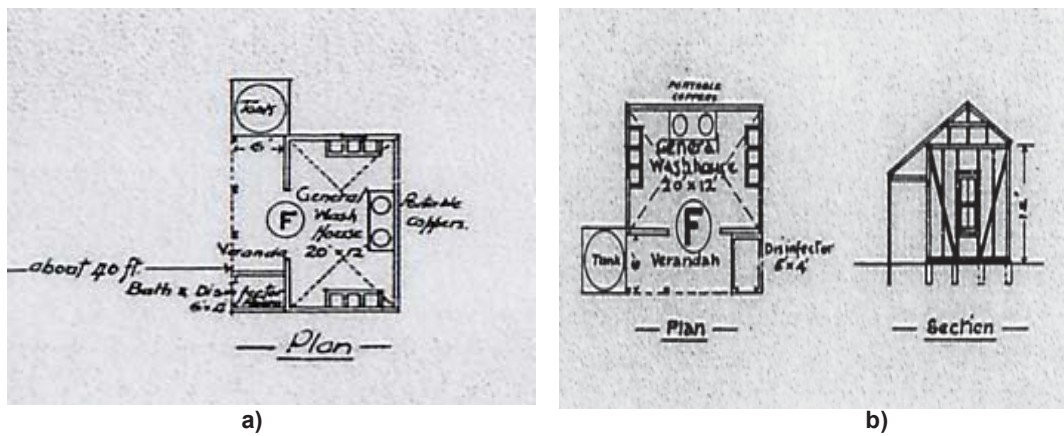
a) 1911 plan of the laundry that was construed on Dorre Island and b) it in an earlier 1910 plan that was never constructed (State Records Office, Cons 1647 P.W.D WA15024).
